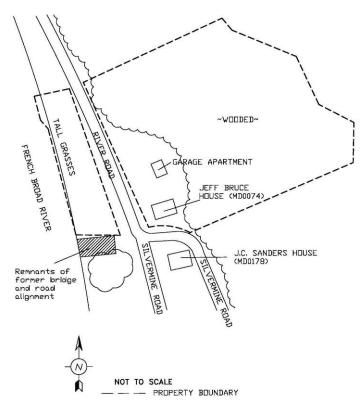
Site Plan of the Jeff Bruce House and Surrounds
